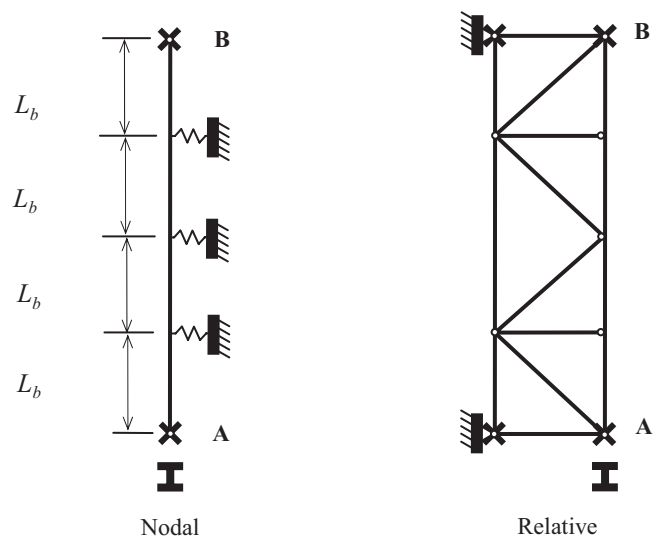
Plan view of beam AB with compression flange lateral brace.
